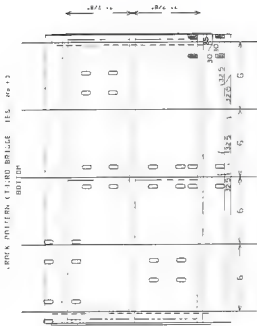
Bottom Cracking Pattern (Third Bridge - Test No 4)
